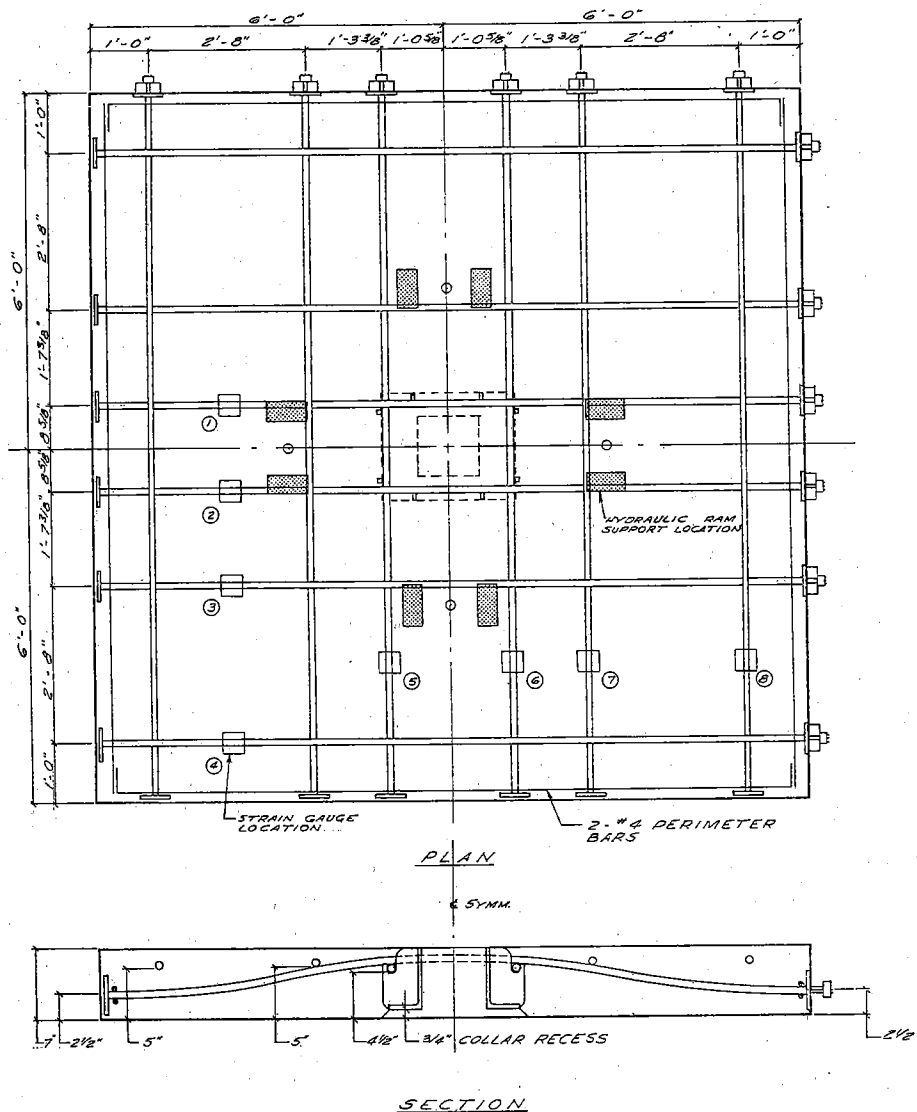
Tendon layout for Specimen L-1 (without supplemental reinforcement)—typical of the lift-slab specimens
